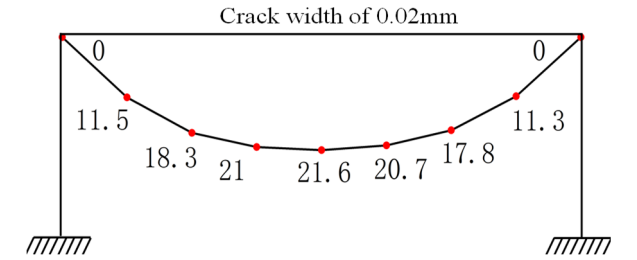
Deflection and crack of prestressed concrete frame beams
